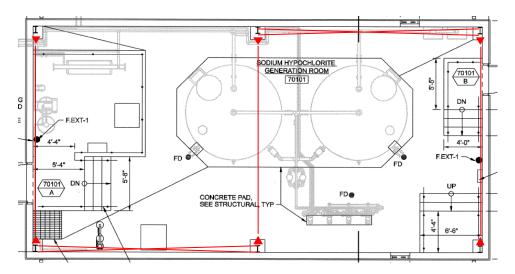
Scheme of Building Lateral Force Resisting Systems (Source Drawings: Water Treatment Plant Expansion to 9.5 MGD (A2007005)")
